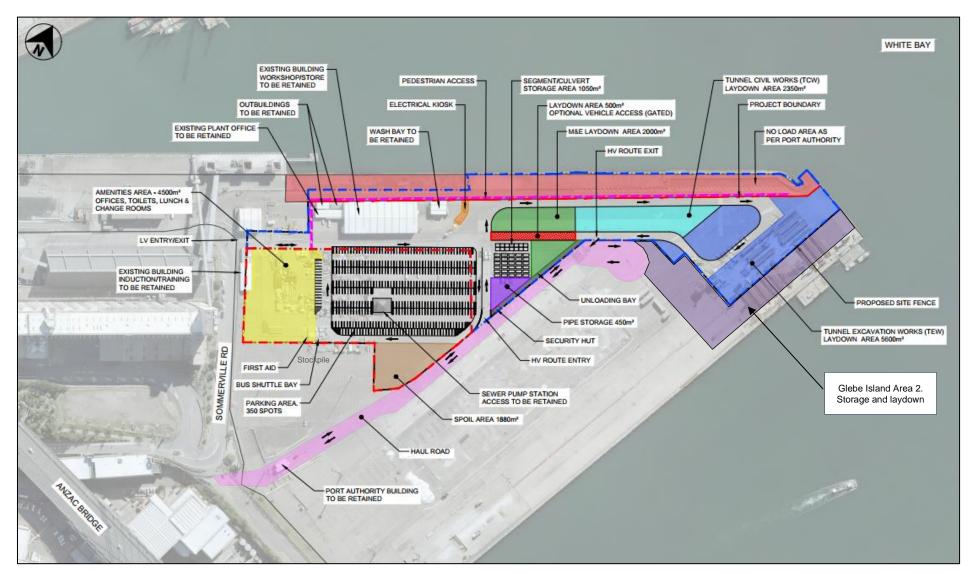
Indicative site layout of Glebe Island (WHT3) construction ancillary facility
